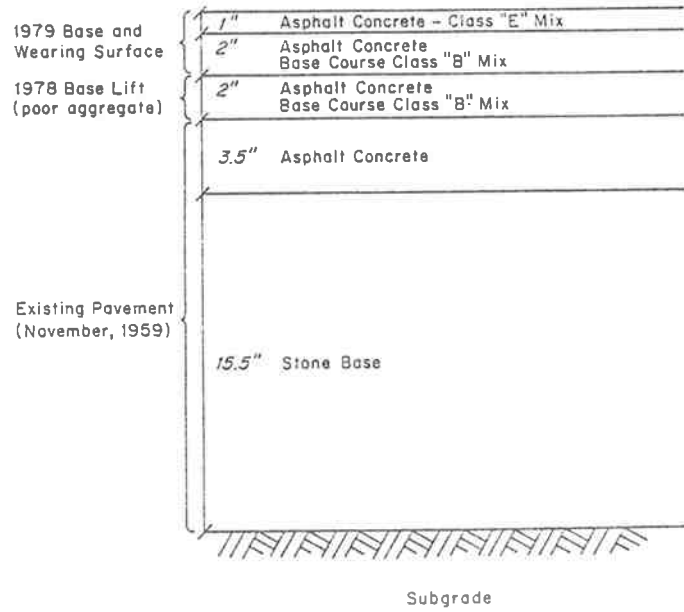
North Oakland - Sutherland Project Pavement Cross-Section
